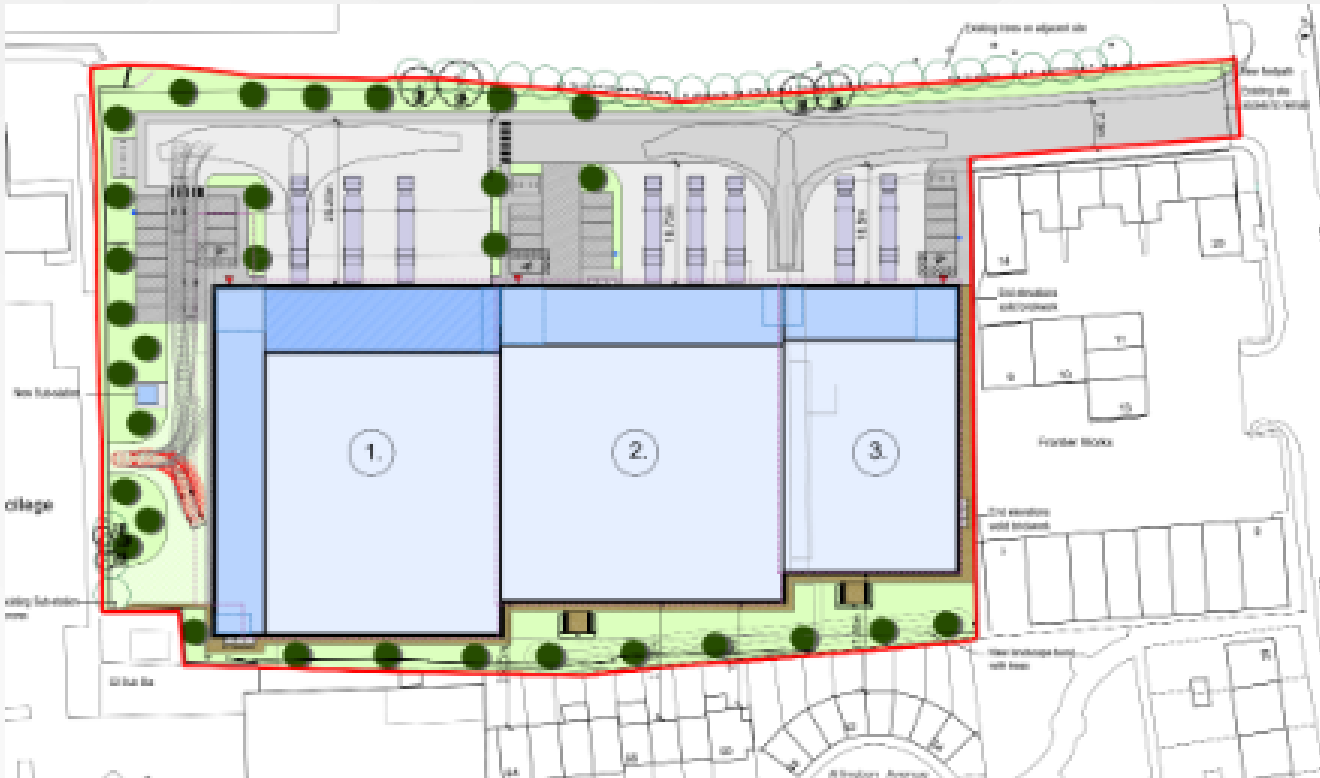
Proposed Site Plan (Source: PRC Architecture)
